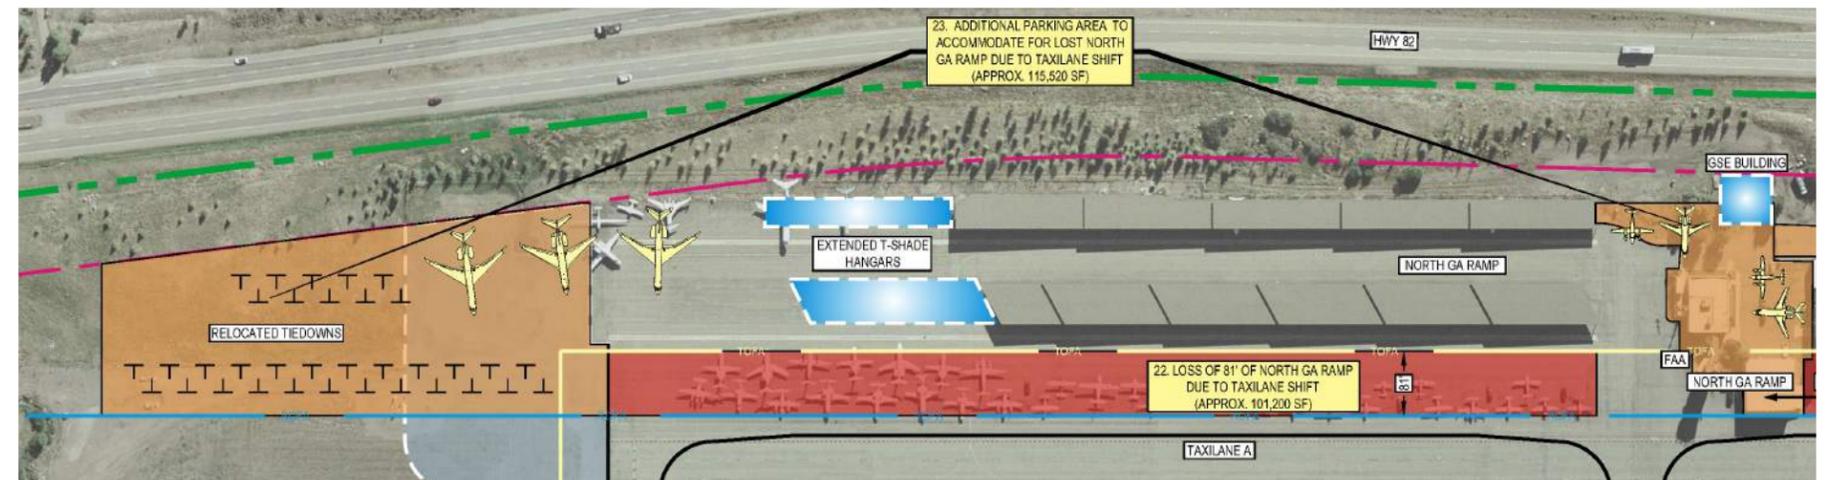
Impacts to Master Plan West Side FBO (Appendix C, Alternatives 7, 7a, and 8, Sheets 4 of 10 and 4 of 7)
